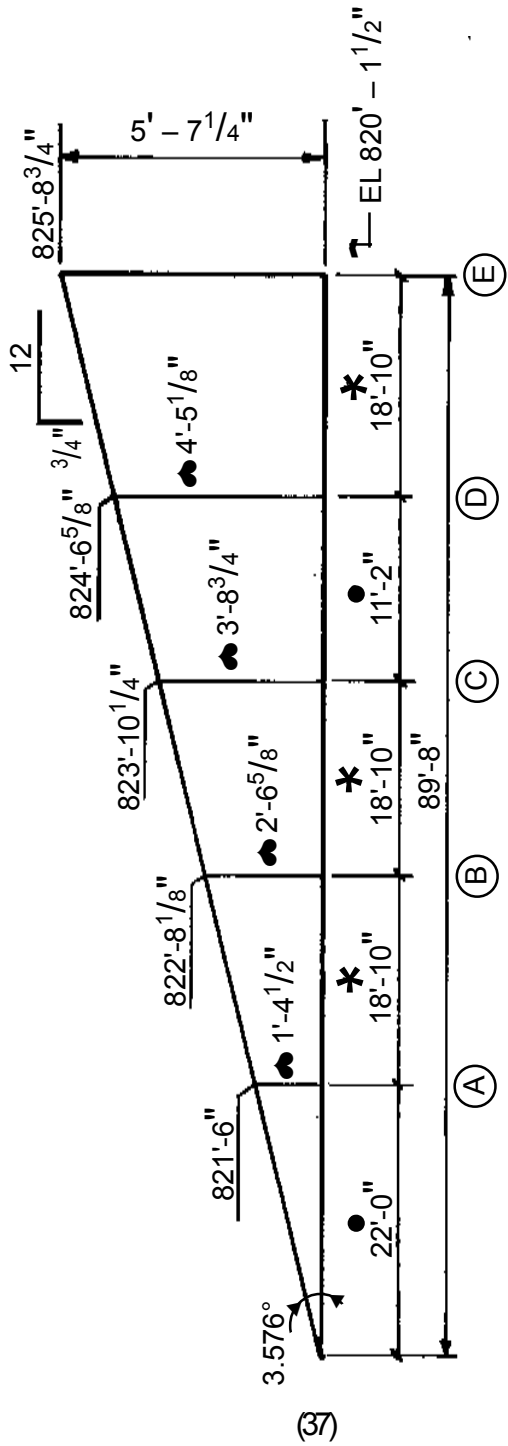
CALCULATING GRADES OR ROOF SLOPE ELEVATIONS
